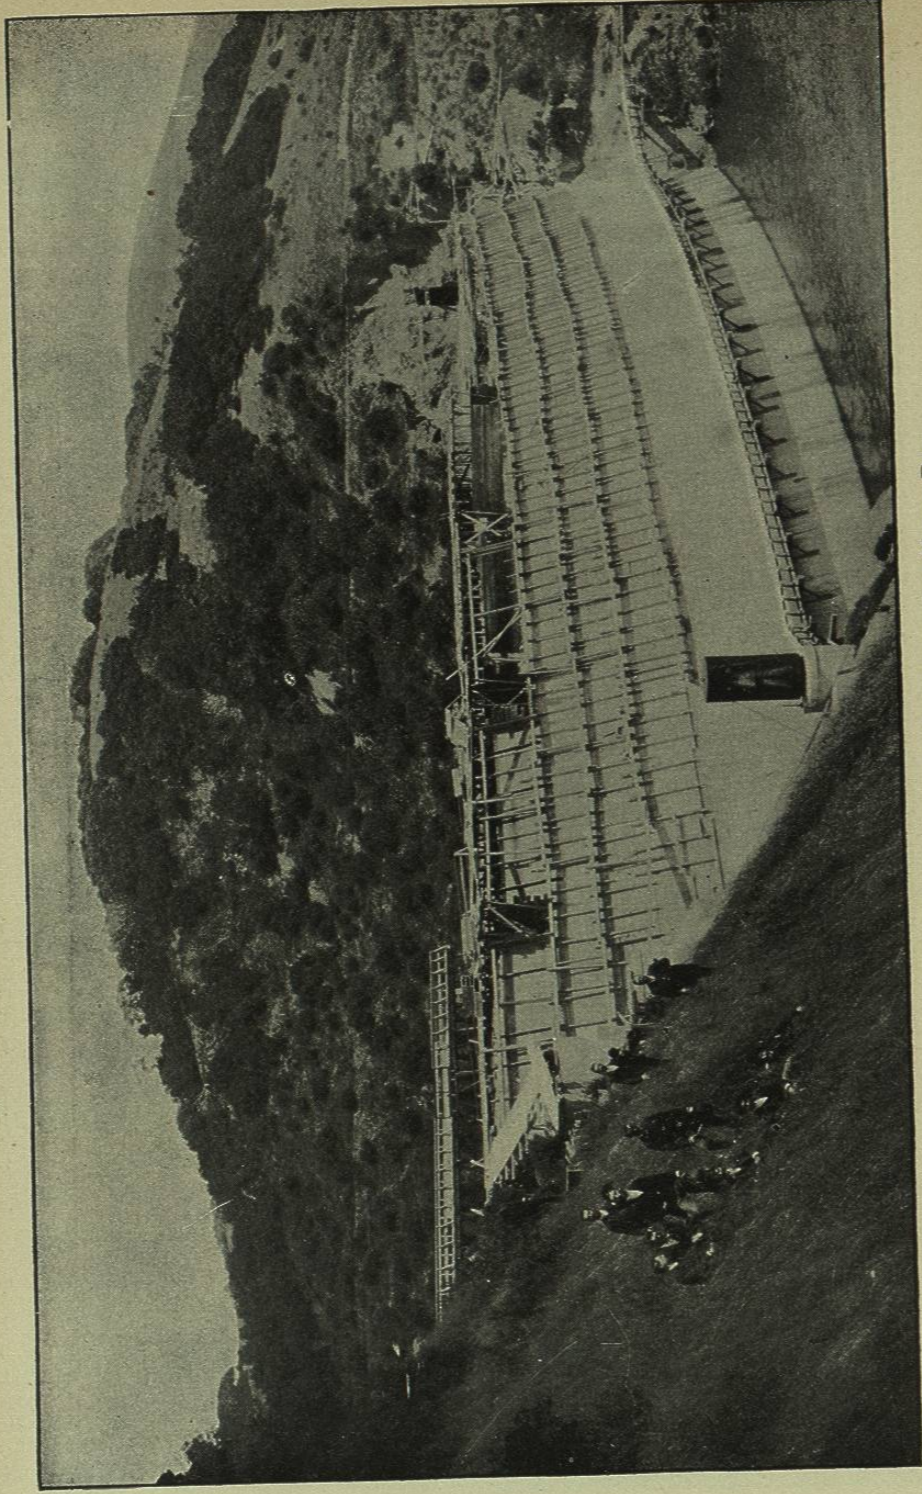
CONSTRUCTION OF INTAKE OF SAN MATEO DAM.
